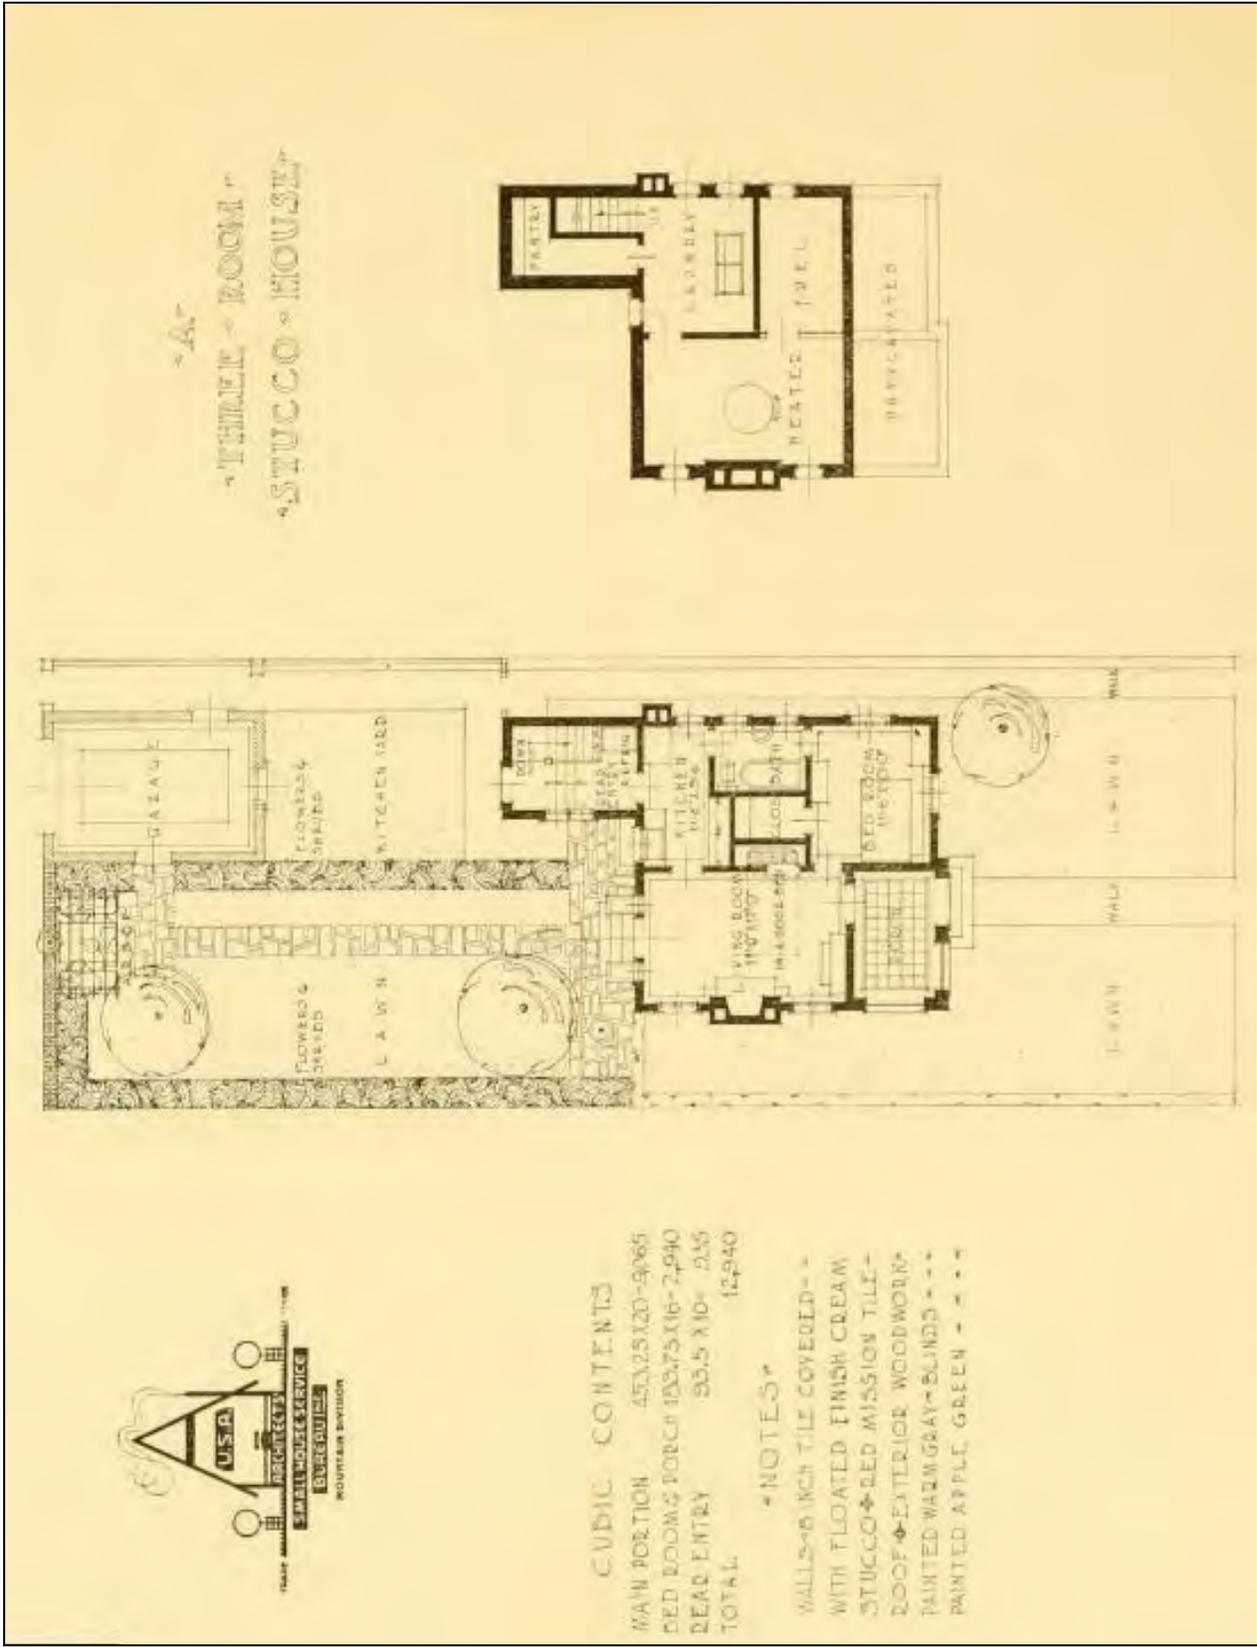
Plan No. 302 (Source: Architects' Small House Service Bureau 1922).
